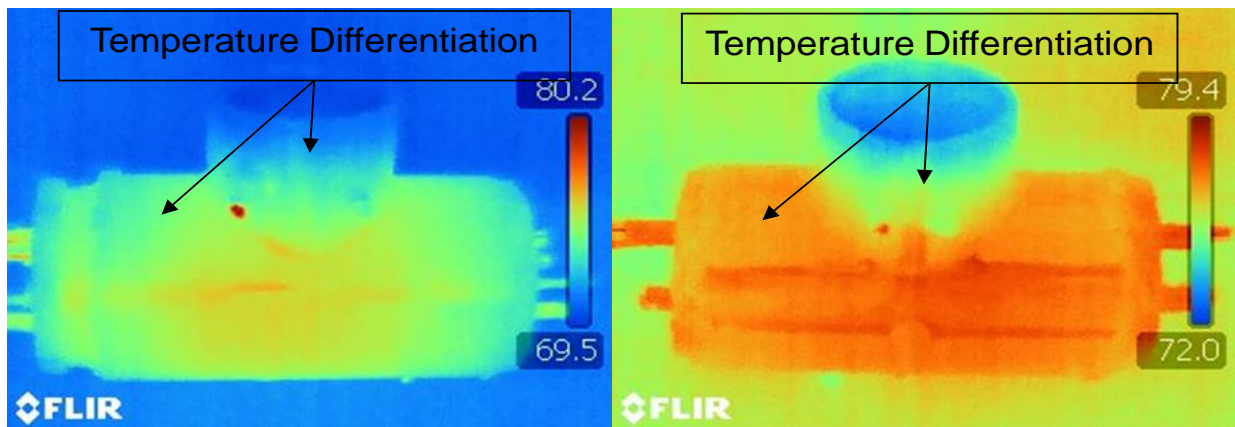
Infrared testing of samples: 4 hr after casting (left); 18 hr of casting (right).
